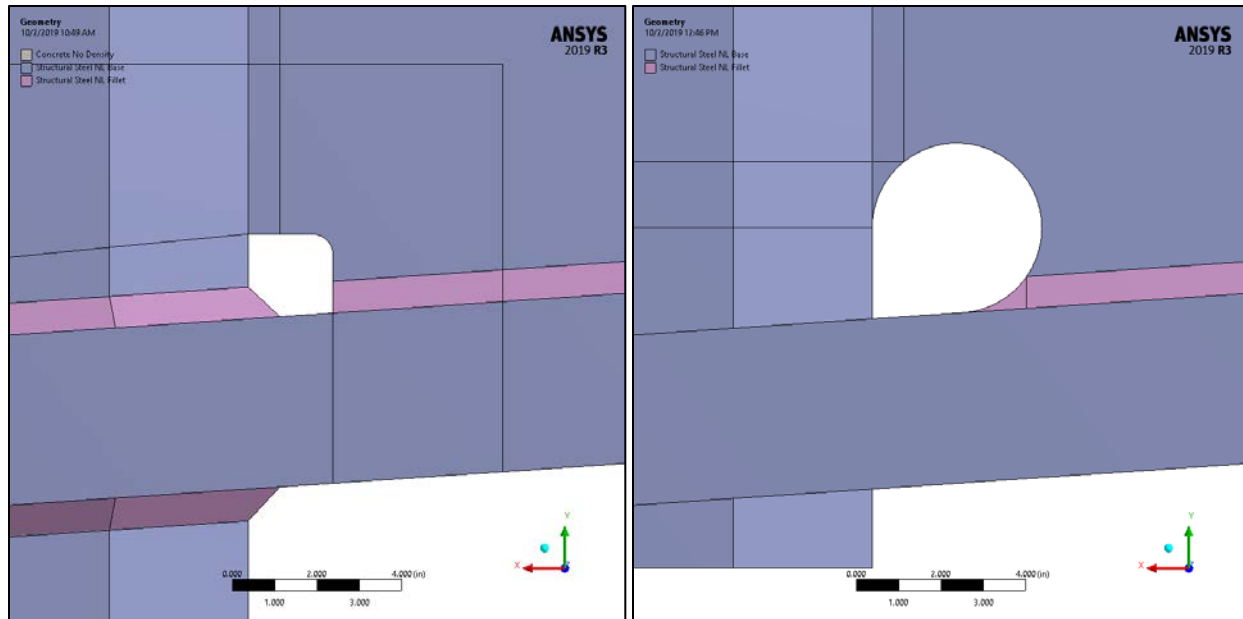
As-built geometry (left) and modified geometry with drilled web access holes and removed fillet welds (right).
